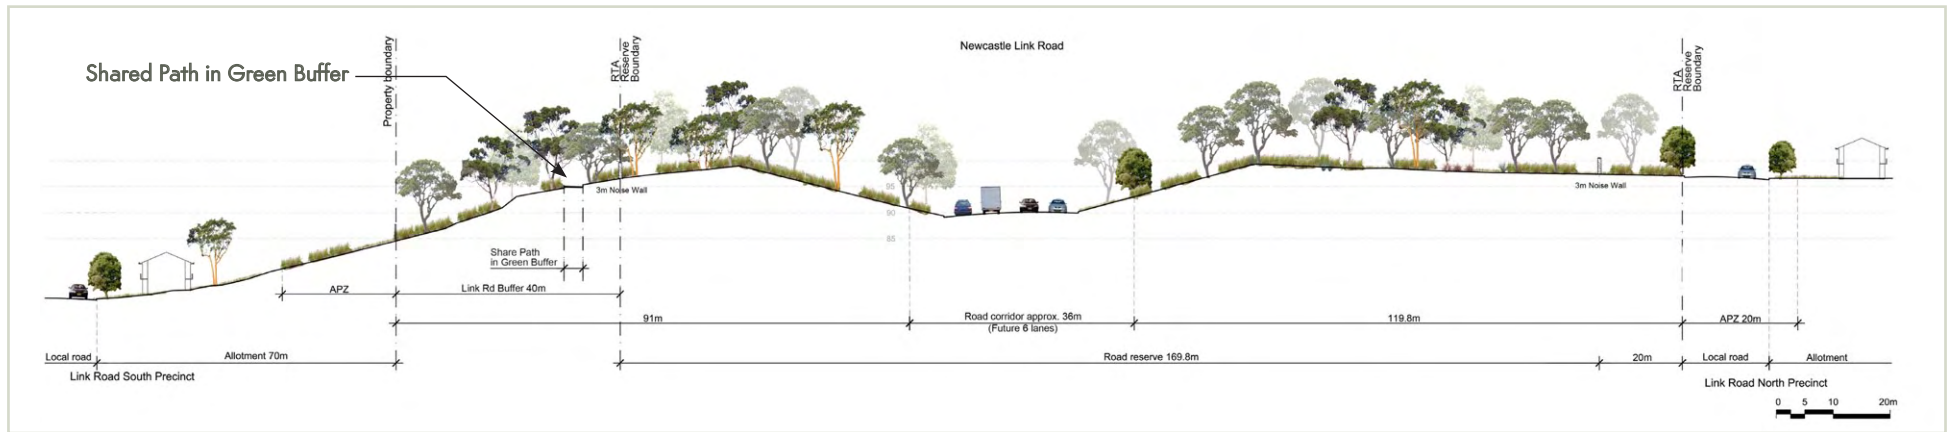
Newcastle Link Road - Link Road North Precinct to Link Road South (Section B-B)
